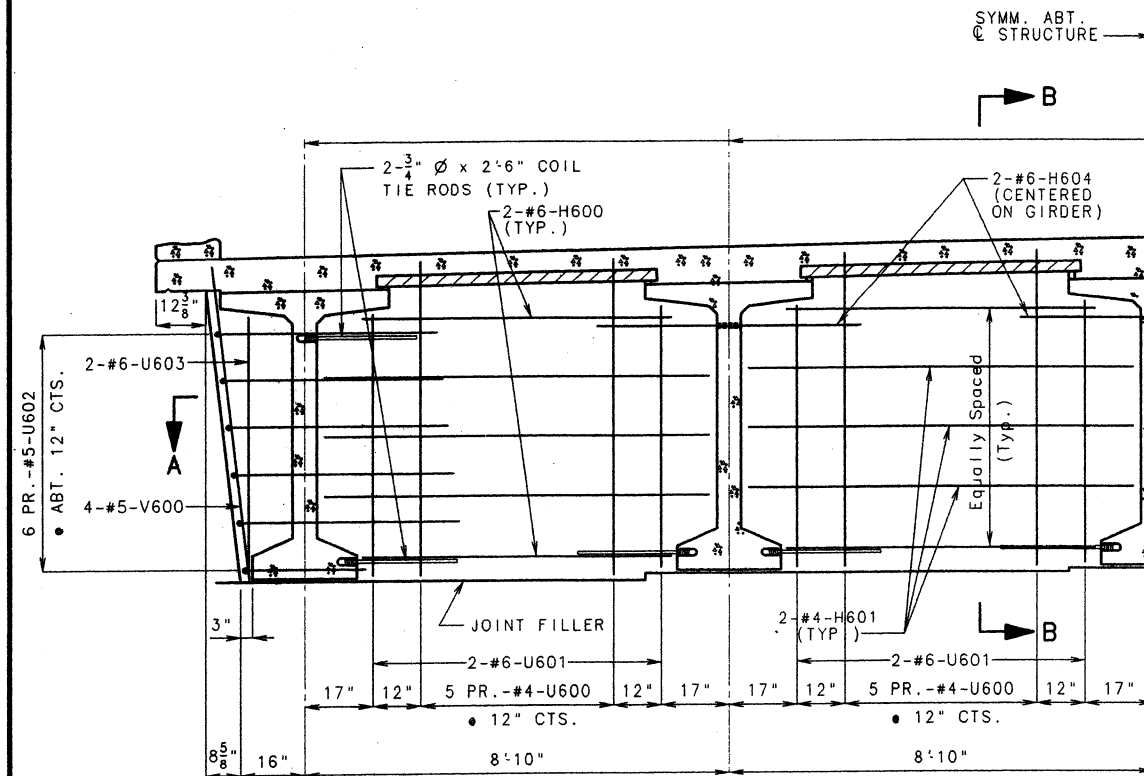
DETAILS OF INTERMEDIATE BENT DIAPHRAGM
